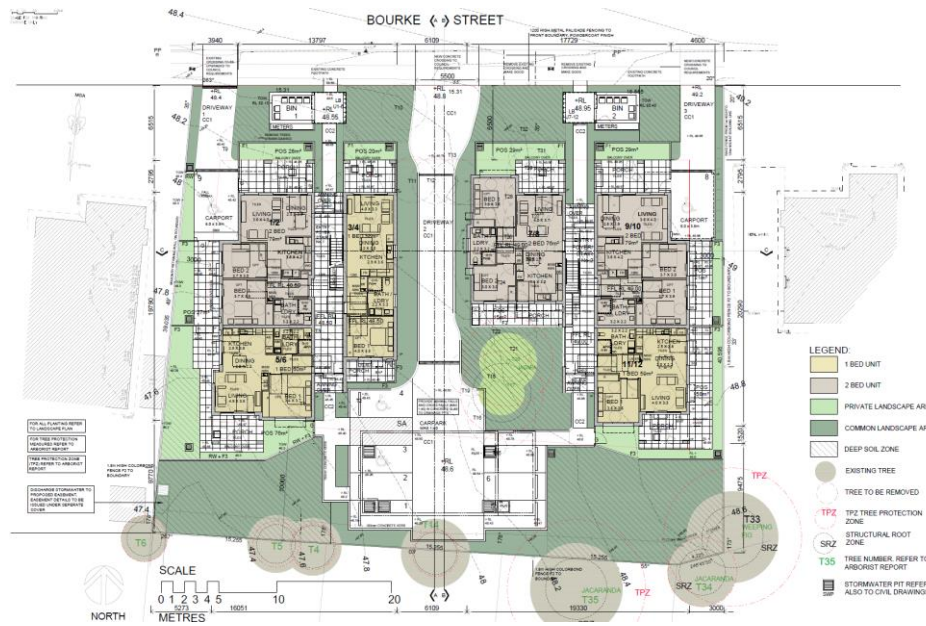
Site/Ground Floor Plan, Source: Barry Rush & Associates Pty
